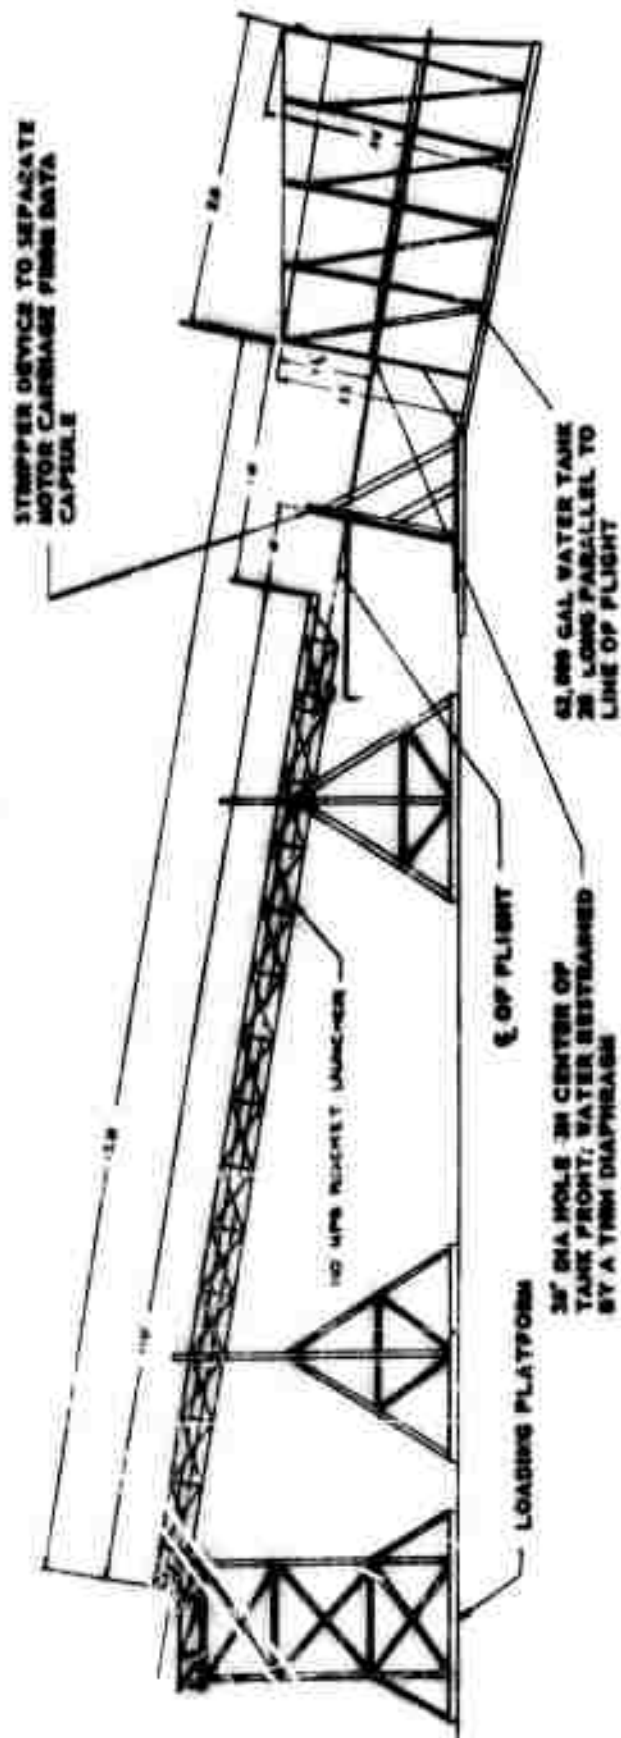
Elevation view of Dahlgren Naval Proving Ground Test Facility
